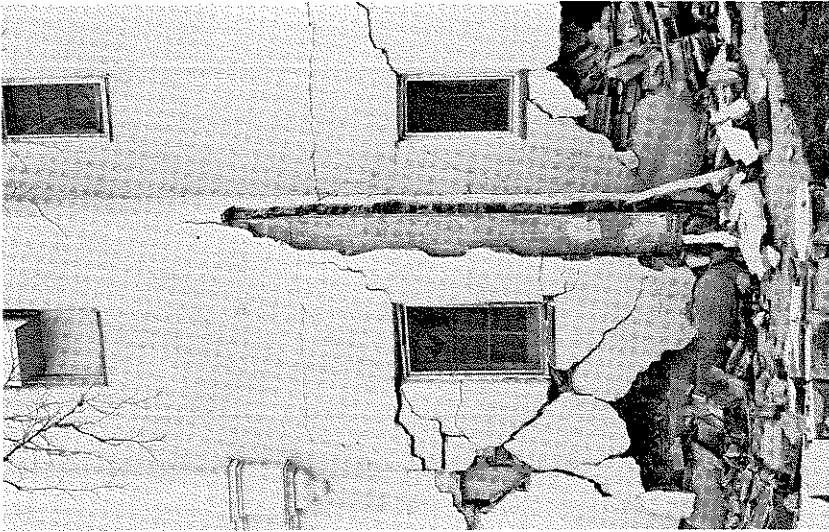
Northeast side of Men's Ambulant Building, Veterans Hospital. Note base of column.
